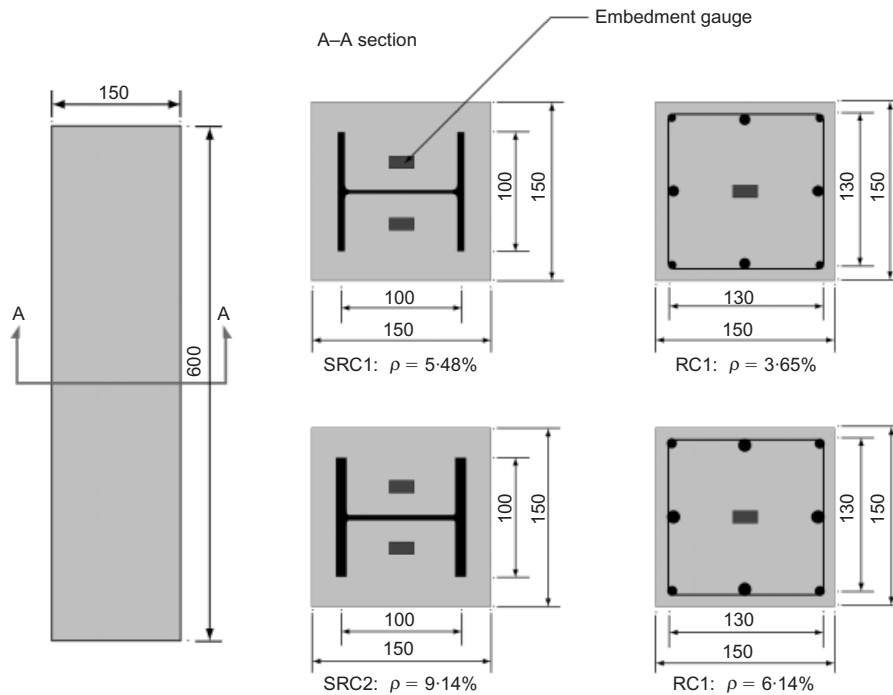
Dimensions and instrumentation of column specimens. Units: mm
